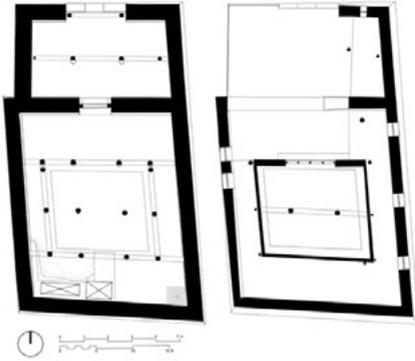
Ground floor (left) and first floor (right) plans. Image credit: Hilde Vets architect.
